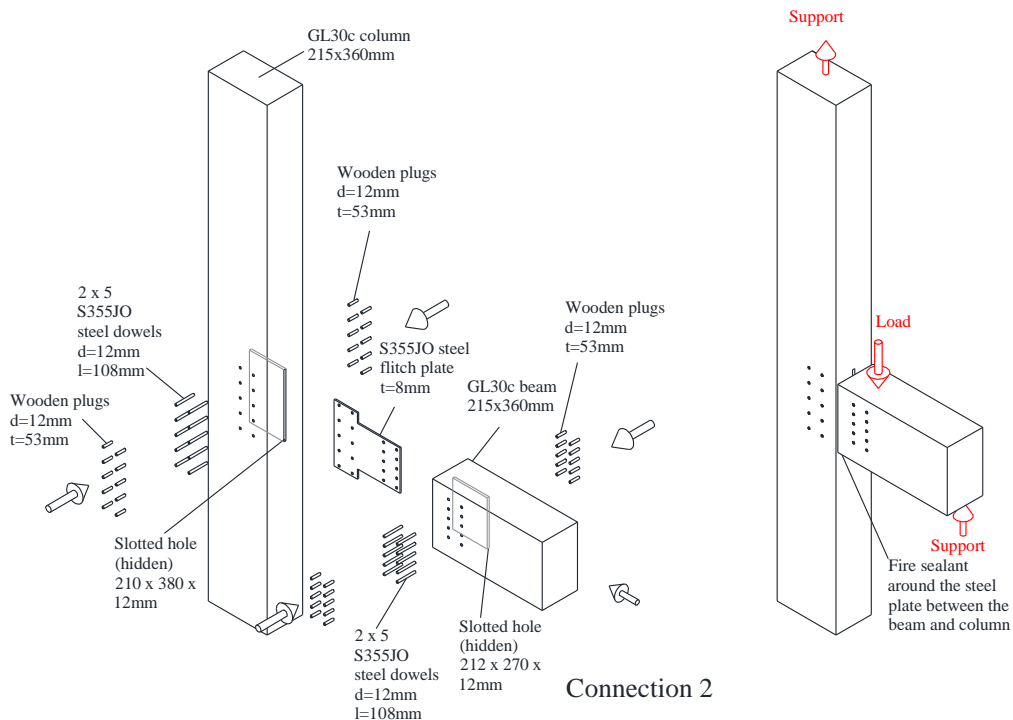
Exploded view of connection 2 (left) and assembled connection 2 (right)
